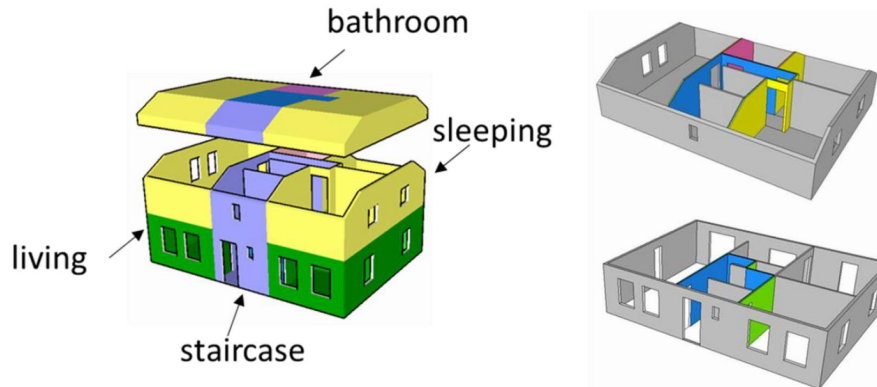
Illustration of the geometry of the K45 test house: division of the heated volume into four thermal zones (left) and layout of the ground and first floors showing zone separating walls (Masy (2008)).
